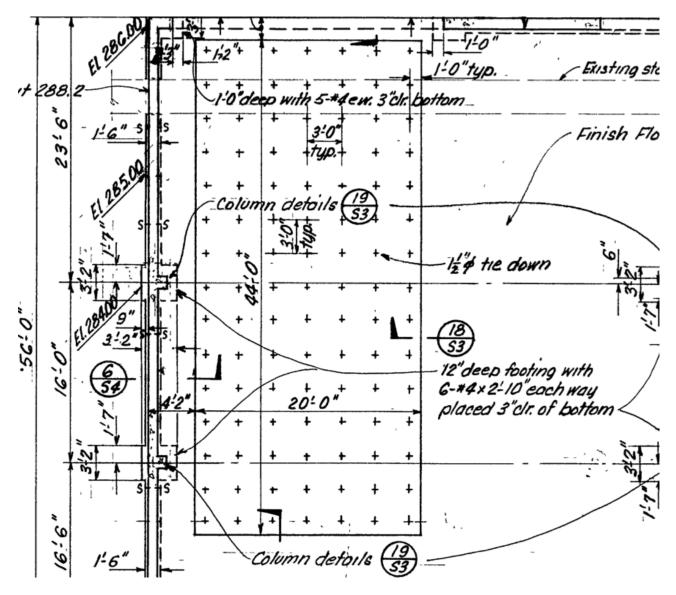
Strong Floor Plan (J. Shelton, 1974)
